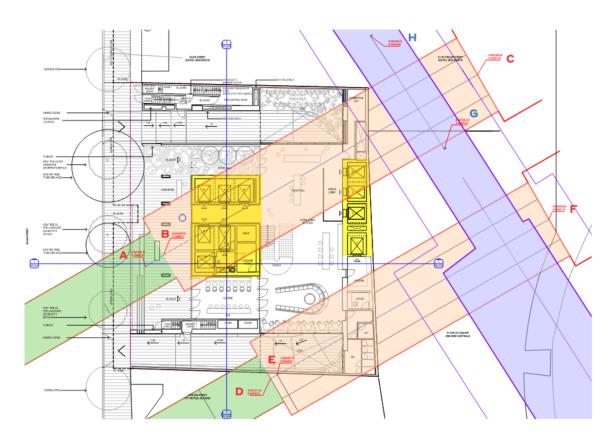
Sydney Metro Tunnel Layouts overlay with development
